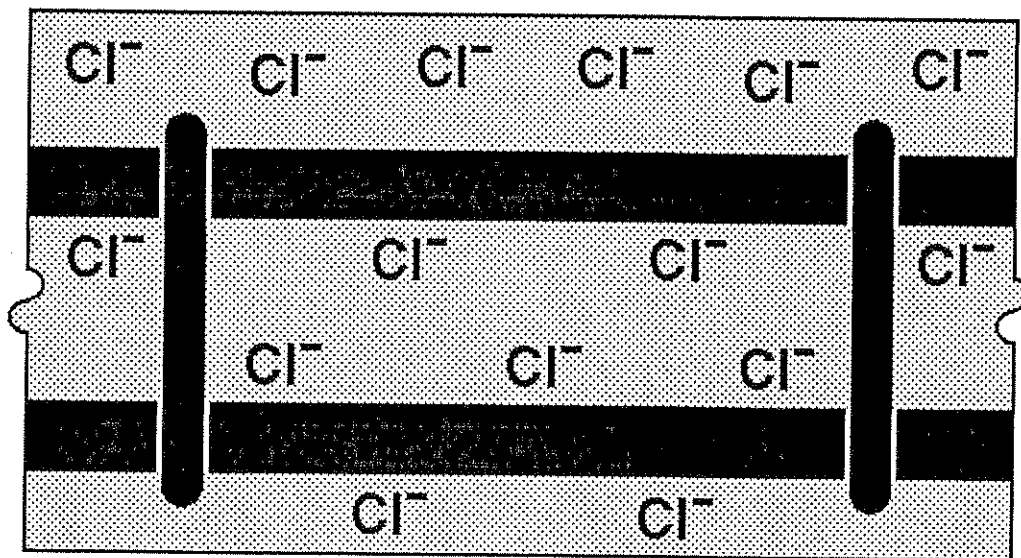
Differential Chloride Concentration in Contaminated Bridge Deck Concrete (After Ref. 5).
